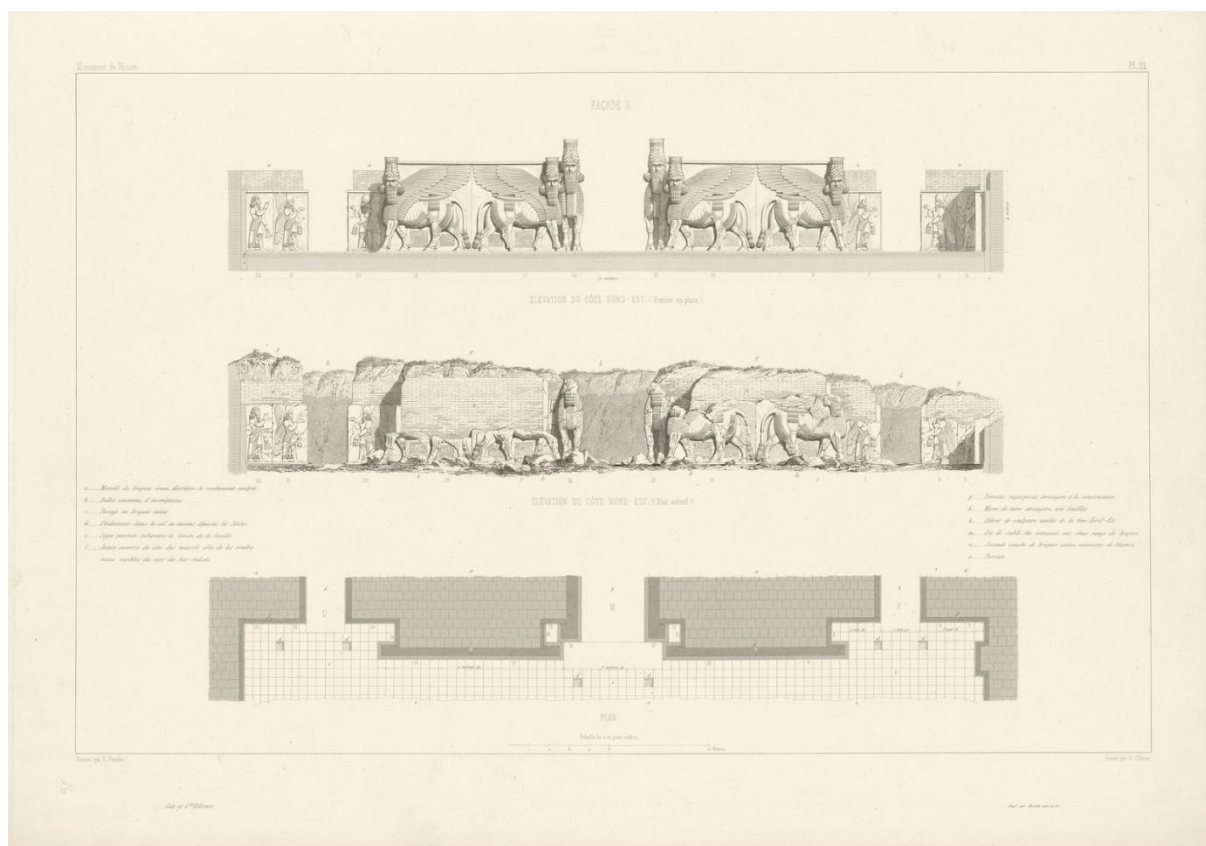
Reconstructed arrangement of façade N of Sargon II's palace, Khorsabad.²⁹
